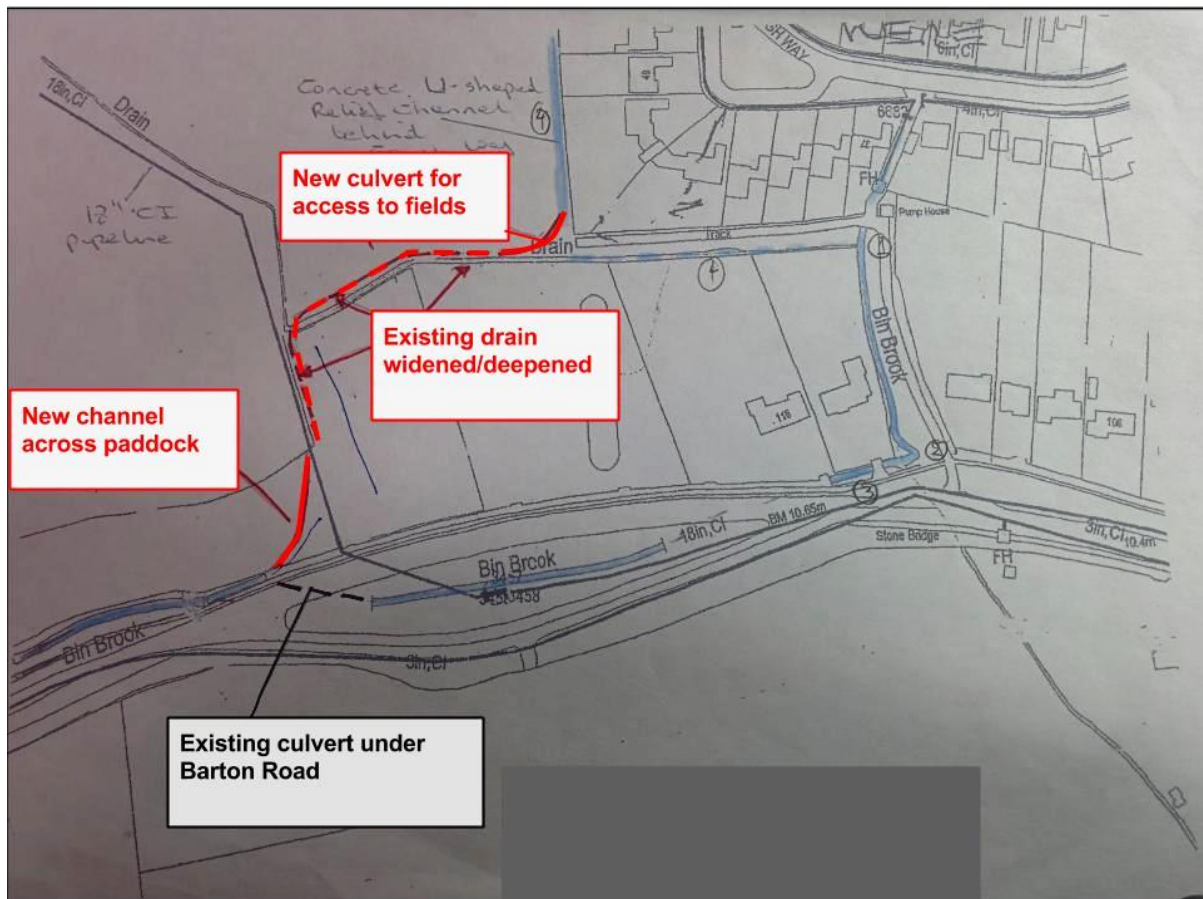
The proposed new diversion channel, diverting flow from upstream of the first Barton Road culvert to the existing relief channel
